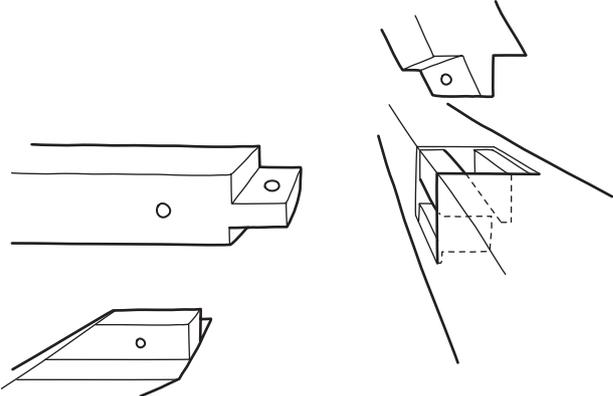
Principal hammerbeam (bottom) and intermediate trusses (top)
